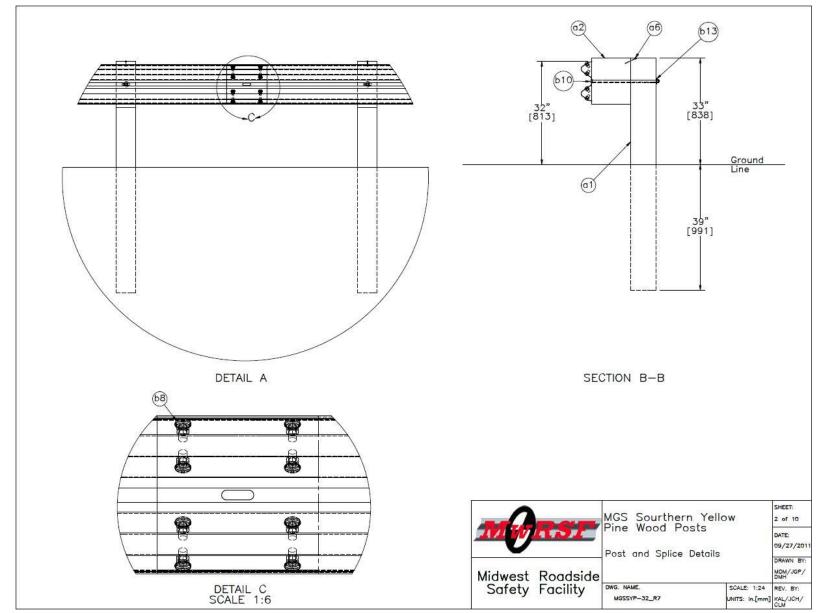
Post and Splice Details, Test No. MGSSYP-2
